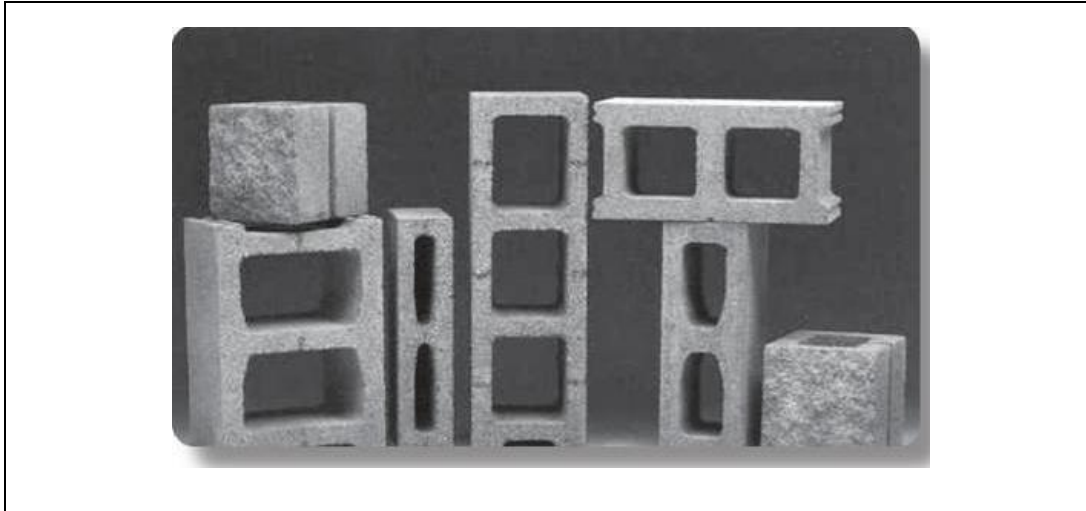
Hollow Concrete Blocks (Ramachandran, 2013).
